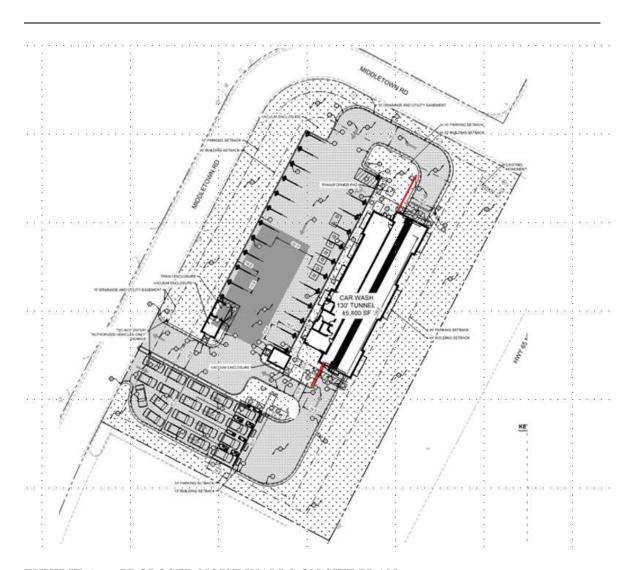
PROPOSED NOISE WALLS ON SITE PLAN
